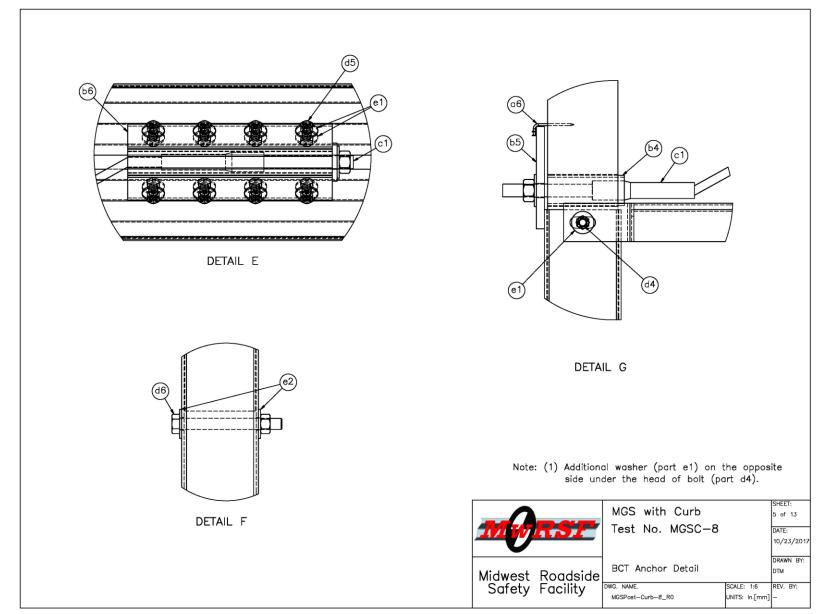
BCT Anchor Detail, Test No. MGSC-8
